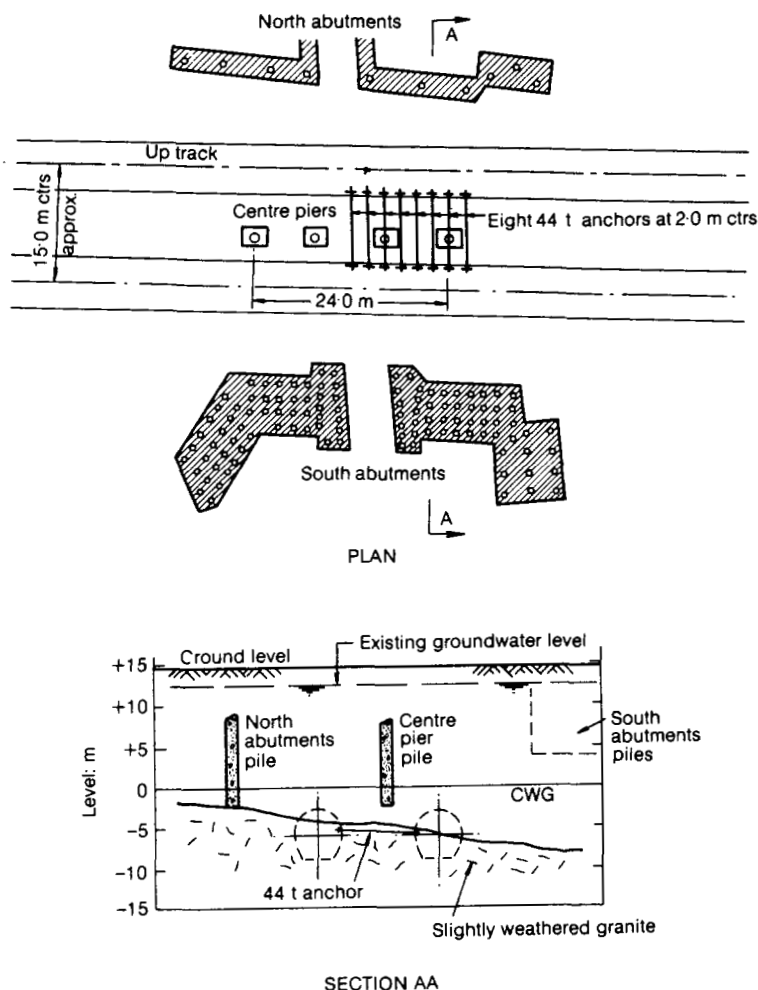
Flyover and tunnel layout at Po Kong interchange
